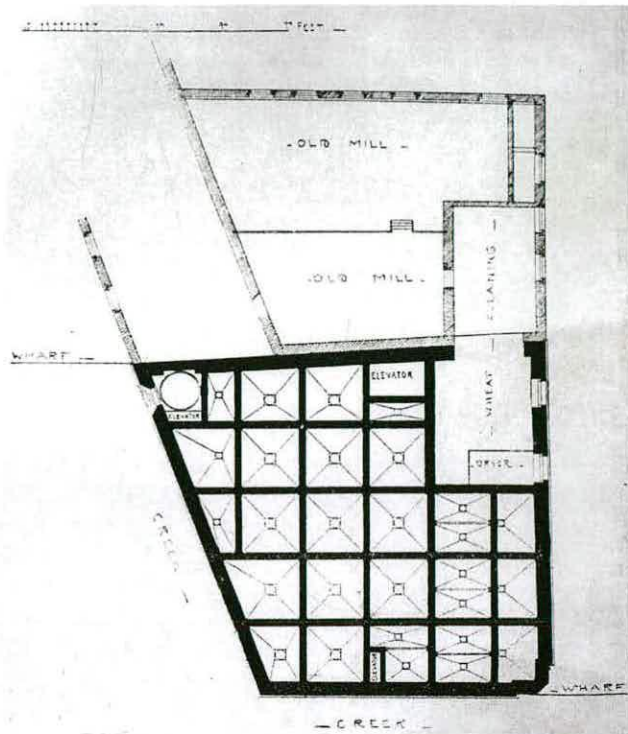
Webb's first-floor plan for the Silo, also showing the West Mill. (The Builder, 1 May 1897, 400).
